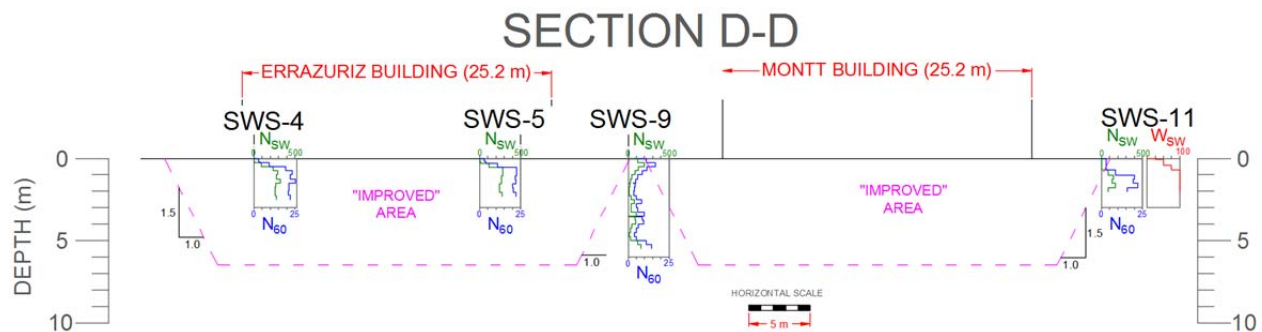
Section D-D through east side of Errazuriz and Montt Buildings.
